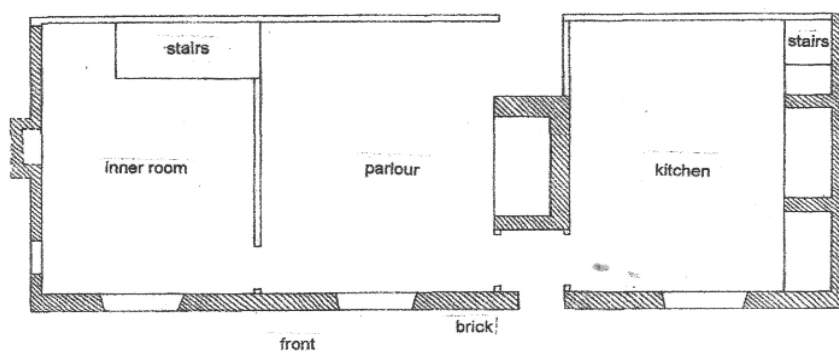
Butlers Farm, Wrabness, medieval hall house, plan of 18th century house
